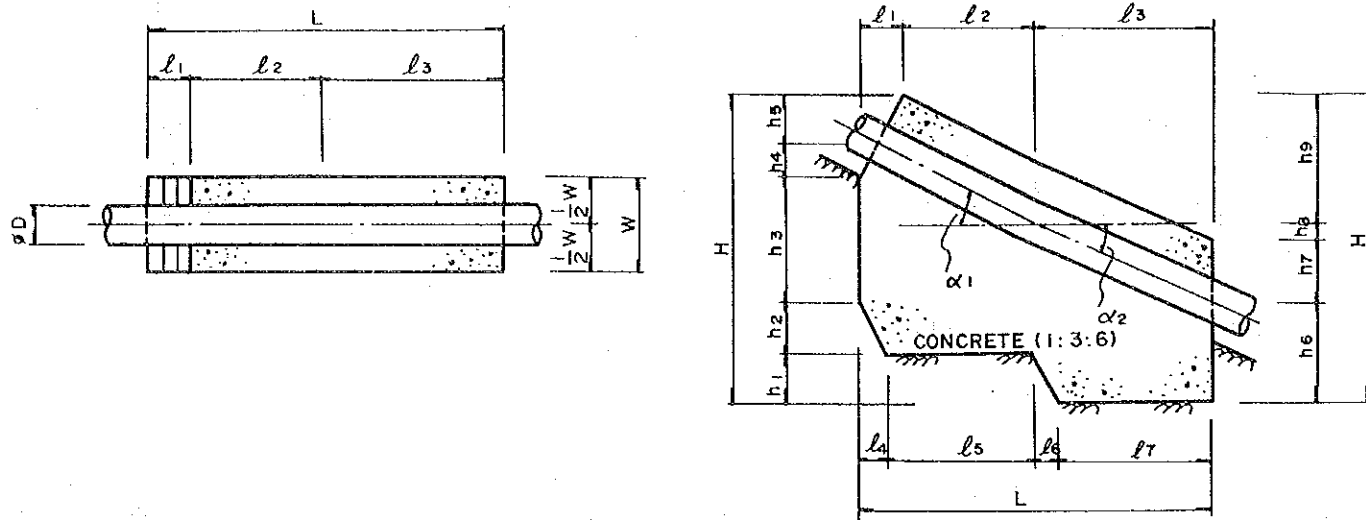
DETAILS FOR PENSTOCK ANCHOR BLOCKS
